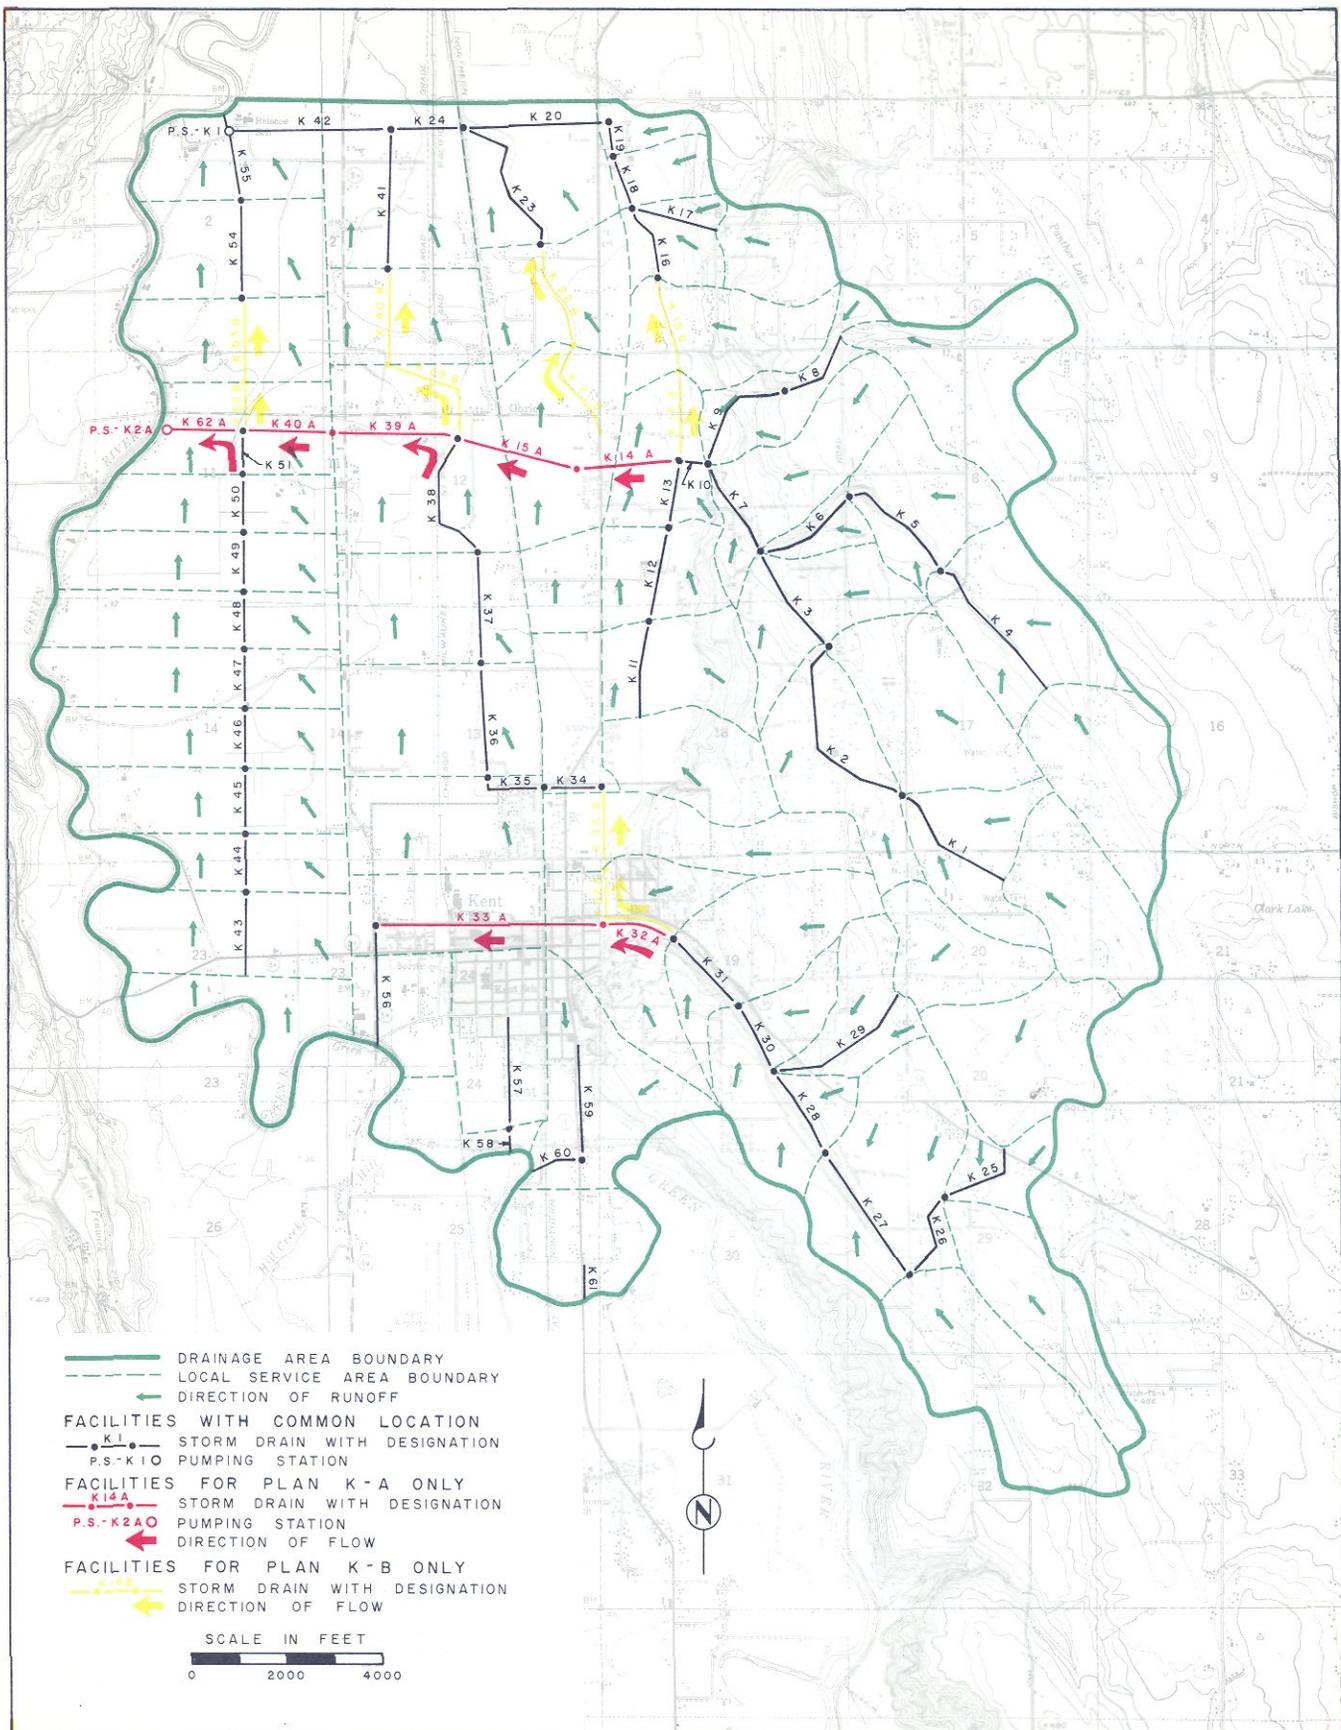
Storm Drainage Plans K-A and K-B, Kent Area
